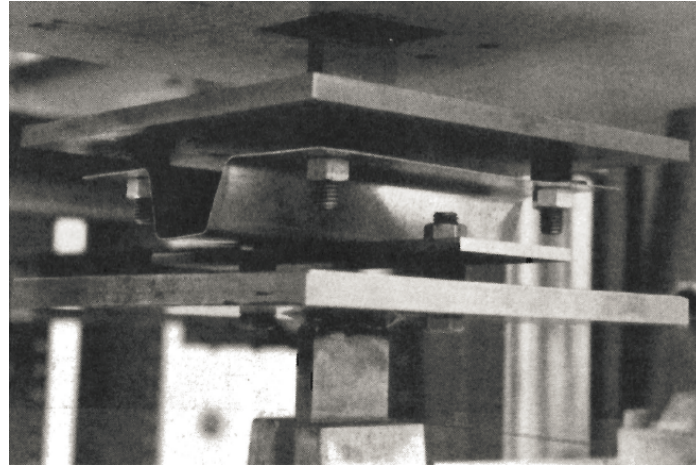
Single sheet configuration in tension test assembly (LaBoube and Yu, 1991).
